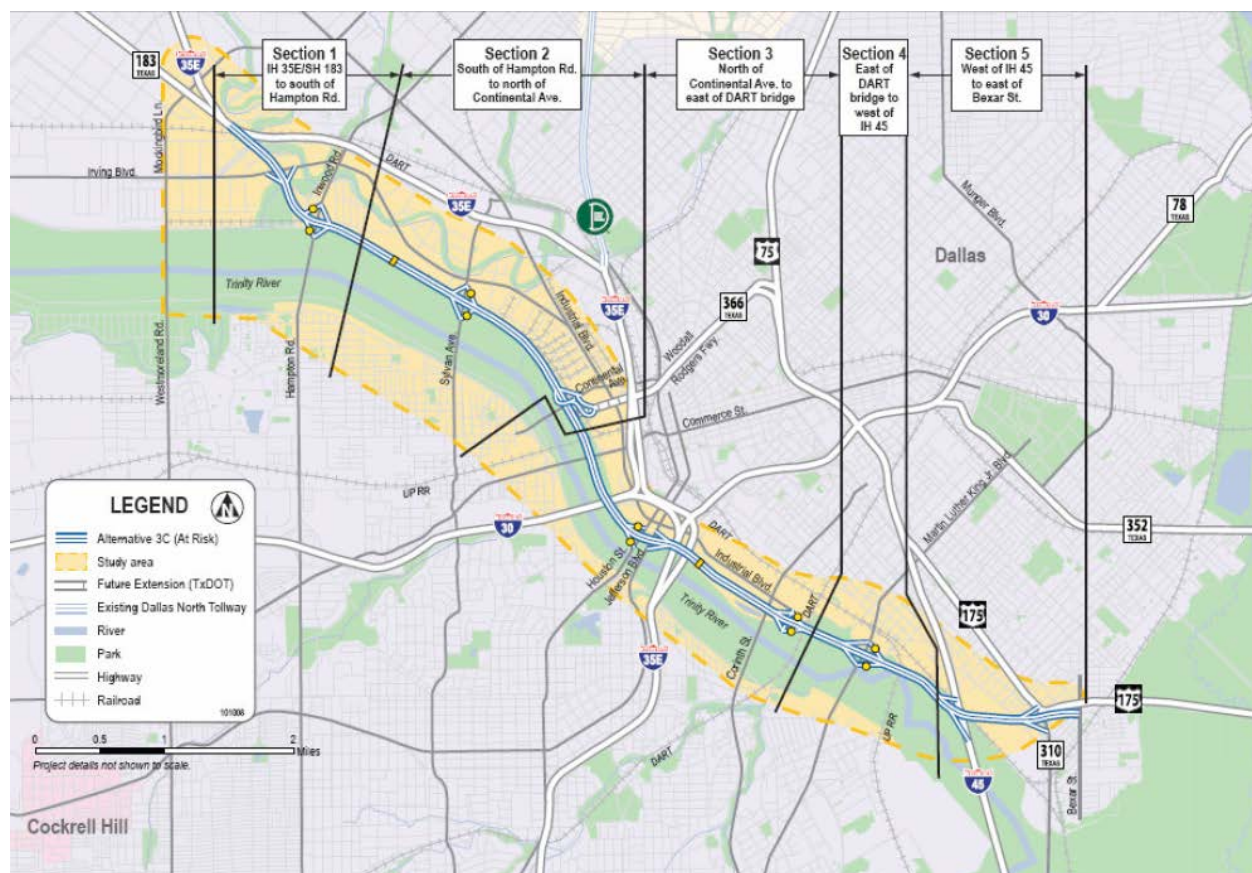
Plan view of the Dallas Floodway showing the Trinity Parkway along the east levee alignment.
